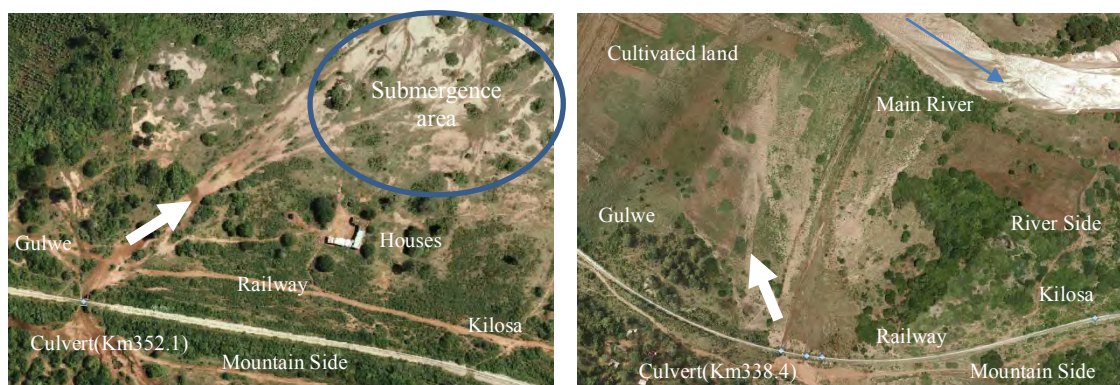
shows examples of culverts without drainage ways. These culverts are usually far from the river. Downstream of these culverts, an area of land is submerged during floods.
